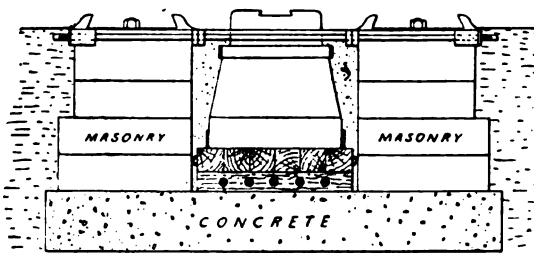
Anvil Block carried on Crossing Timbers, supported on Concrete. Frames supported on Masonry.
